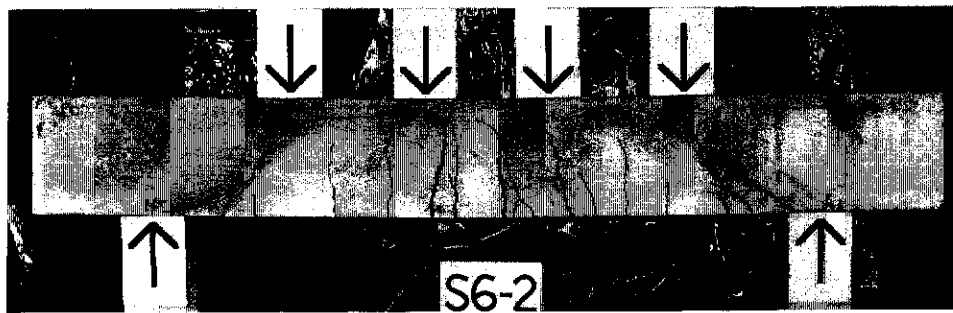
Crack Pattern of the Front Face of Beam S6-2
